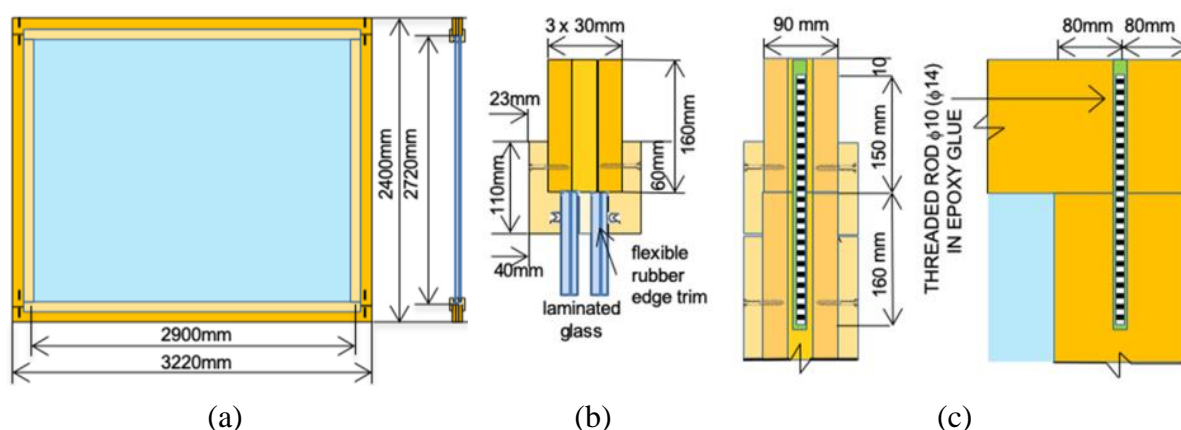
Full-scale CLT-glass facade element: (a) front view, (b) CLT-to-glass frame connection detail (cross-section) and (c) timber frame corner joint.
